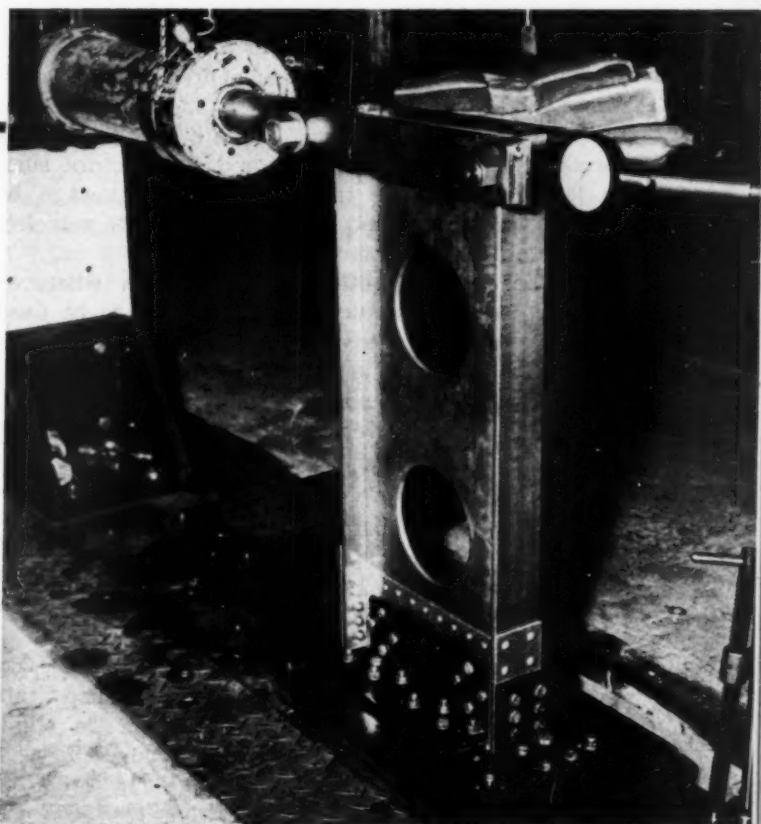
Right — Extruded ZK60A magnesium alloy beam with five - inch lightening holes undergoing combined shear and bending tests
